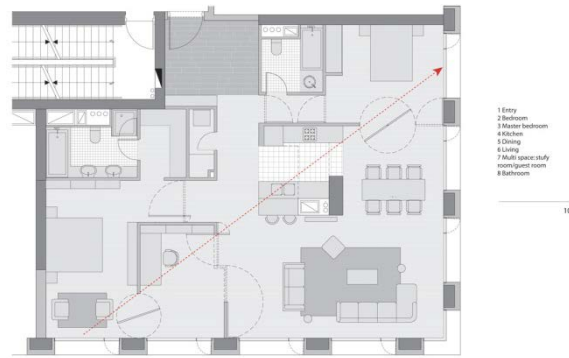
Single unit plan. (Source: <http://www.archdaily.com/34302/linked-hybrid-steven-holl-architects>)
